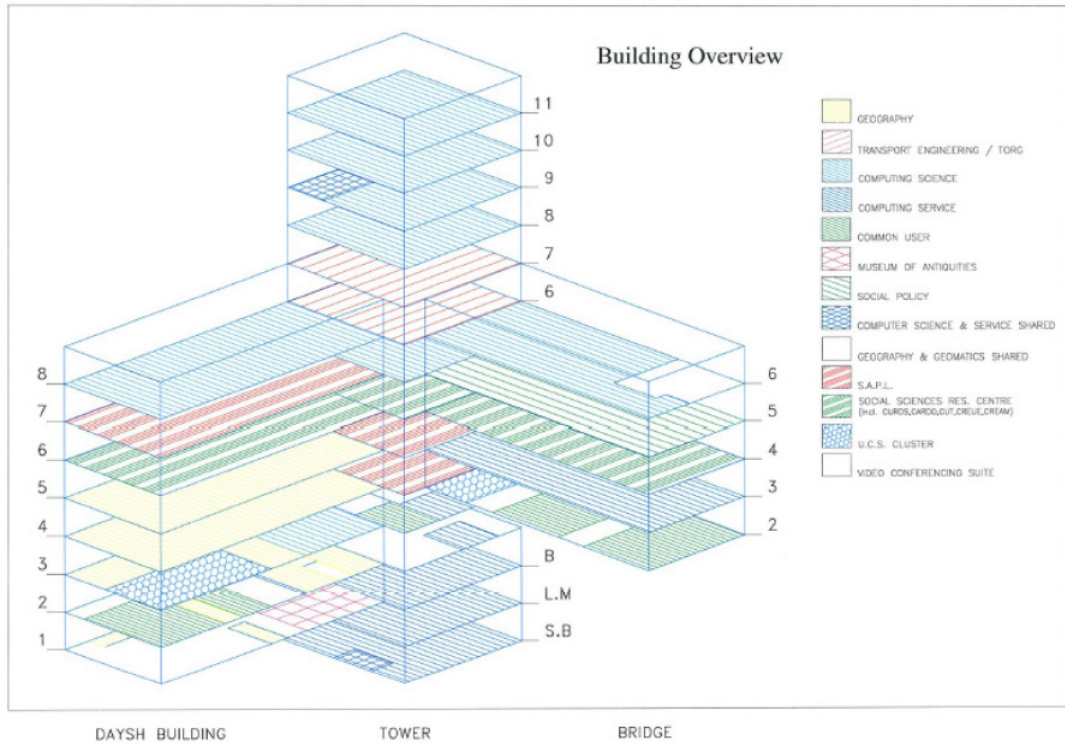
Isometric Plan of Claremont Tower Buildings
